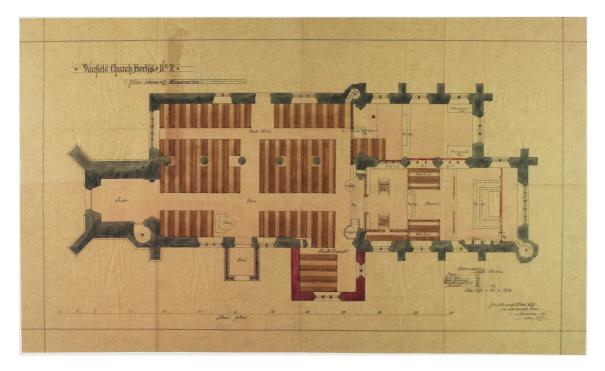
Street's plan of St Michael, Warfield (ICBS07600 © Lambeth Palace Archive)
